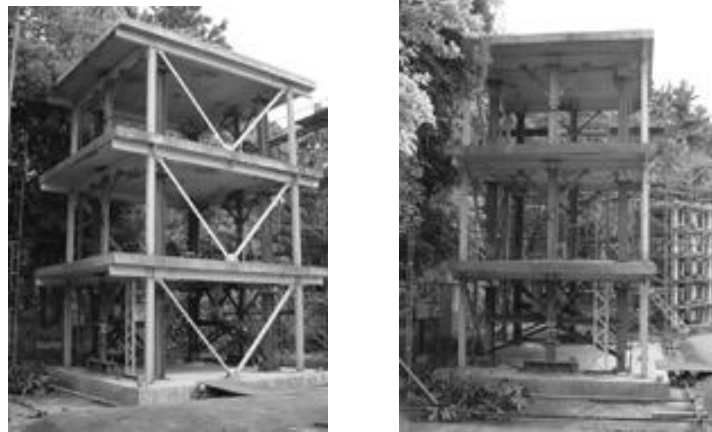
‘Weak’ structural model constructed on the actual ground at Chiba Experiment Station
